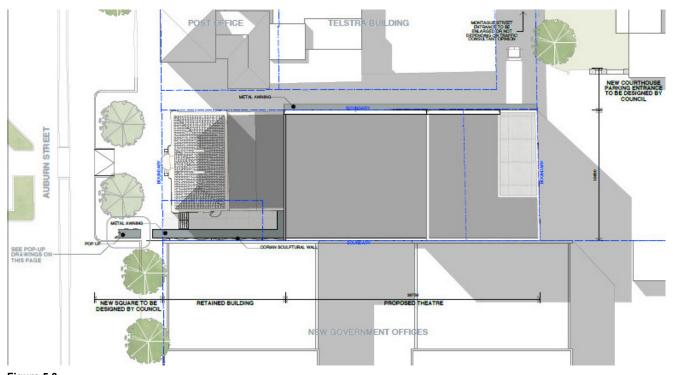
The Proposed Development - Site Plan (A100) Source: Brewster Hjorth Architects
